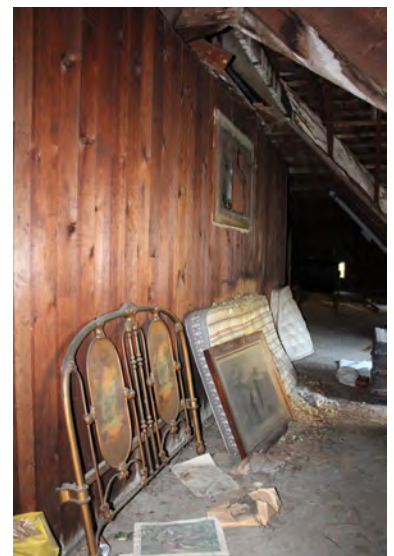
Wood plank walls at groom's bedroom. (HA, 2015)
